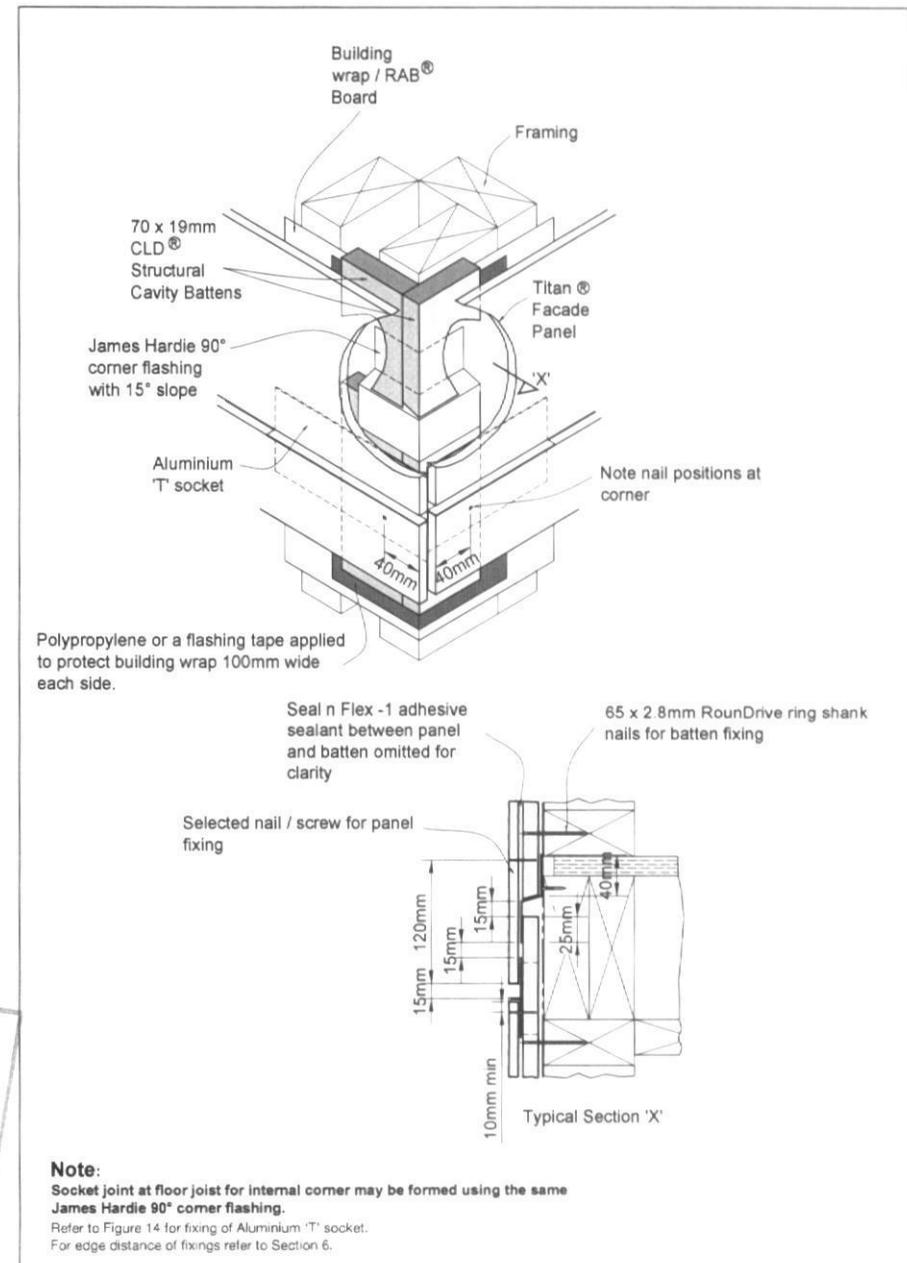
'T' SOCKET JOINT AT FLOOR JOIST CORNER
